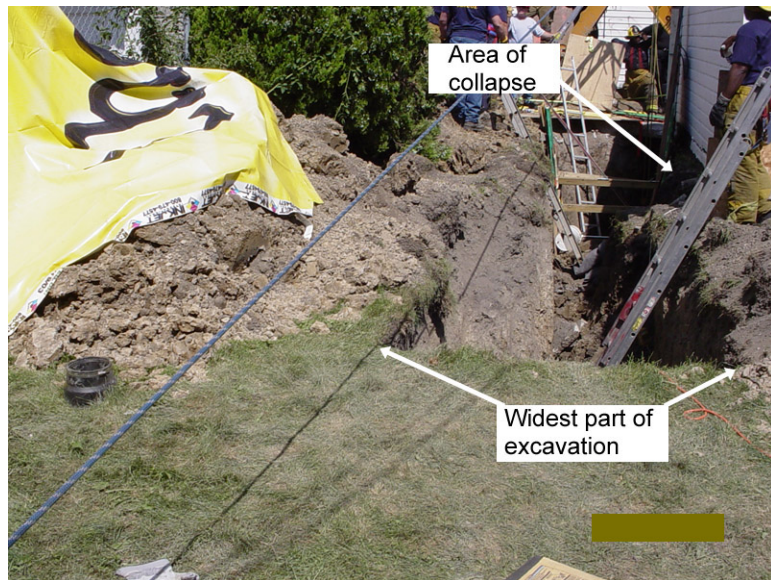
View of excavation from west to east showing widest part, area of collapse, vertical sides and spoils.
